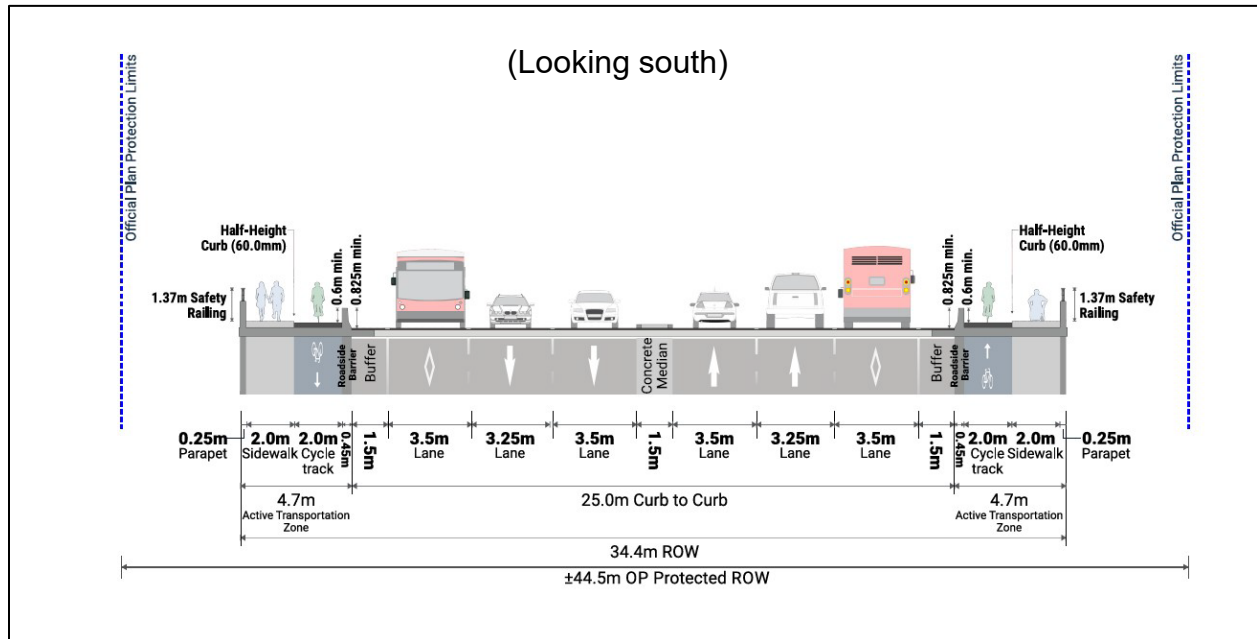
Segment 4 – Lemieux Street to Tremblay Road
